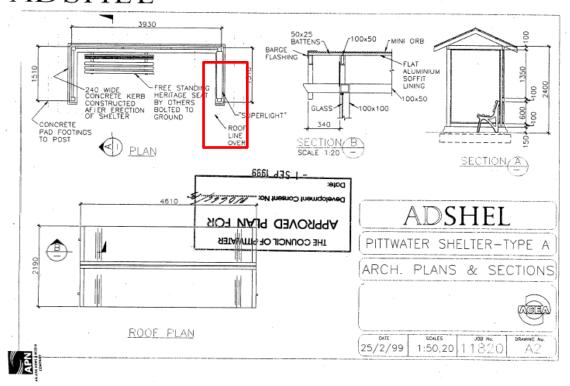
Shelter C5 DA0666/99 Stamped Elevations 2 of 2
